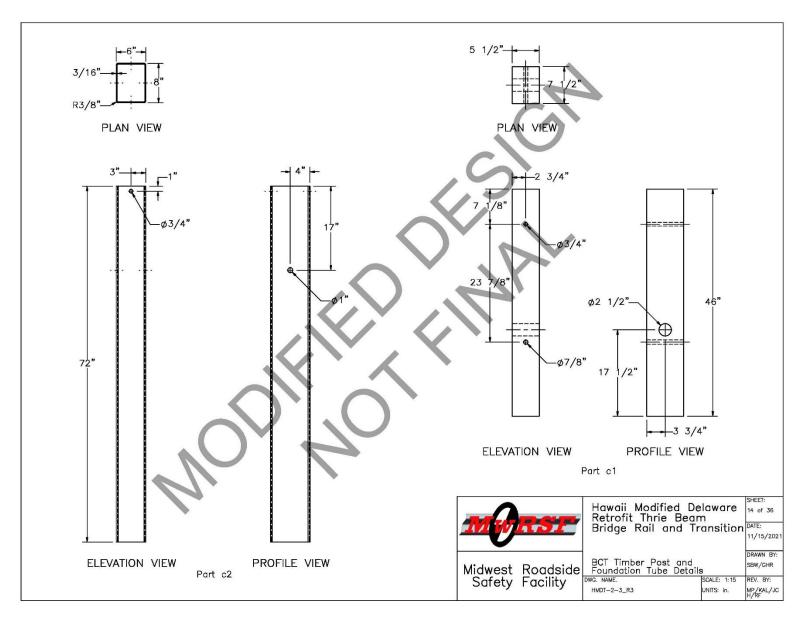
BCT Timber Post and Foundation Tube Details, Test Nos. HMDT-2 and HMDT-3
